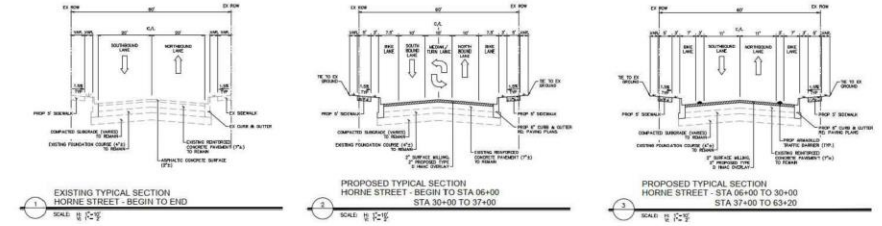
HORNE STREET IMPROVEMENTS
